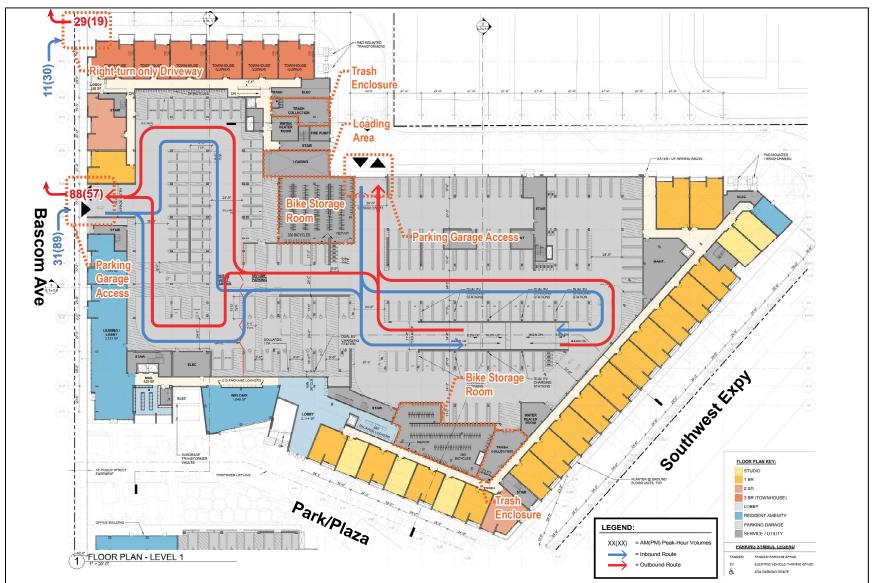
Residential Building Site Plan and Circulation (with Gross Project Trips)
